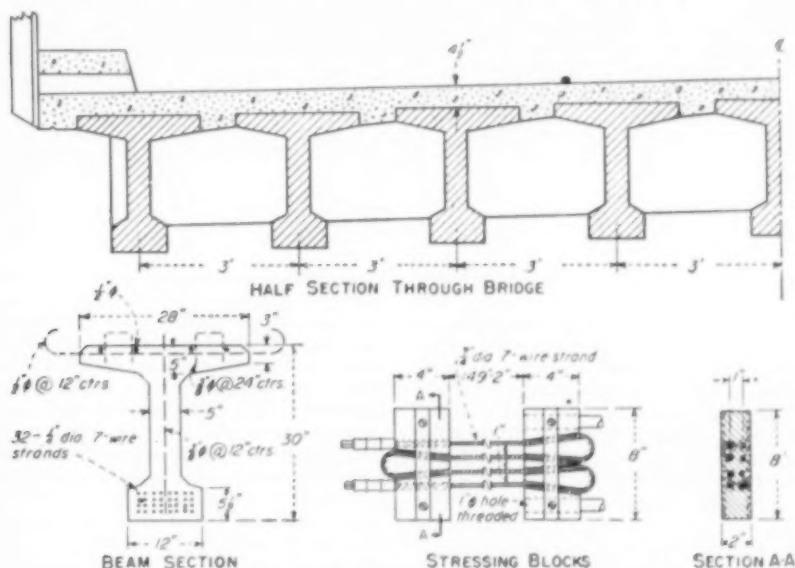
Details of the Beams and the Temporary Anchor-blocks.
